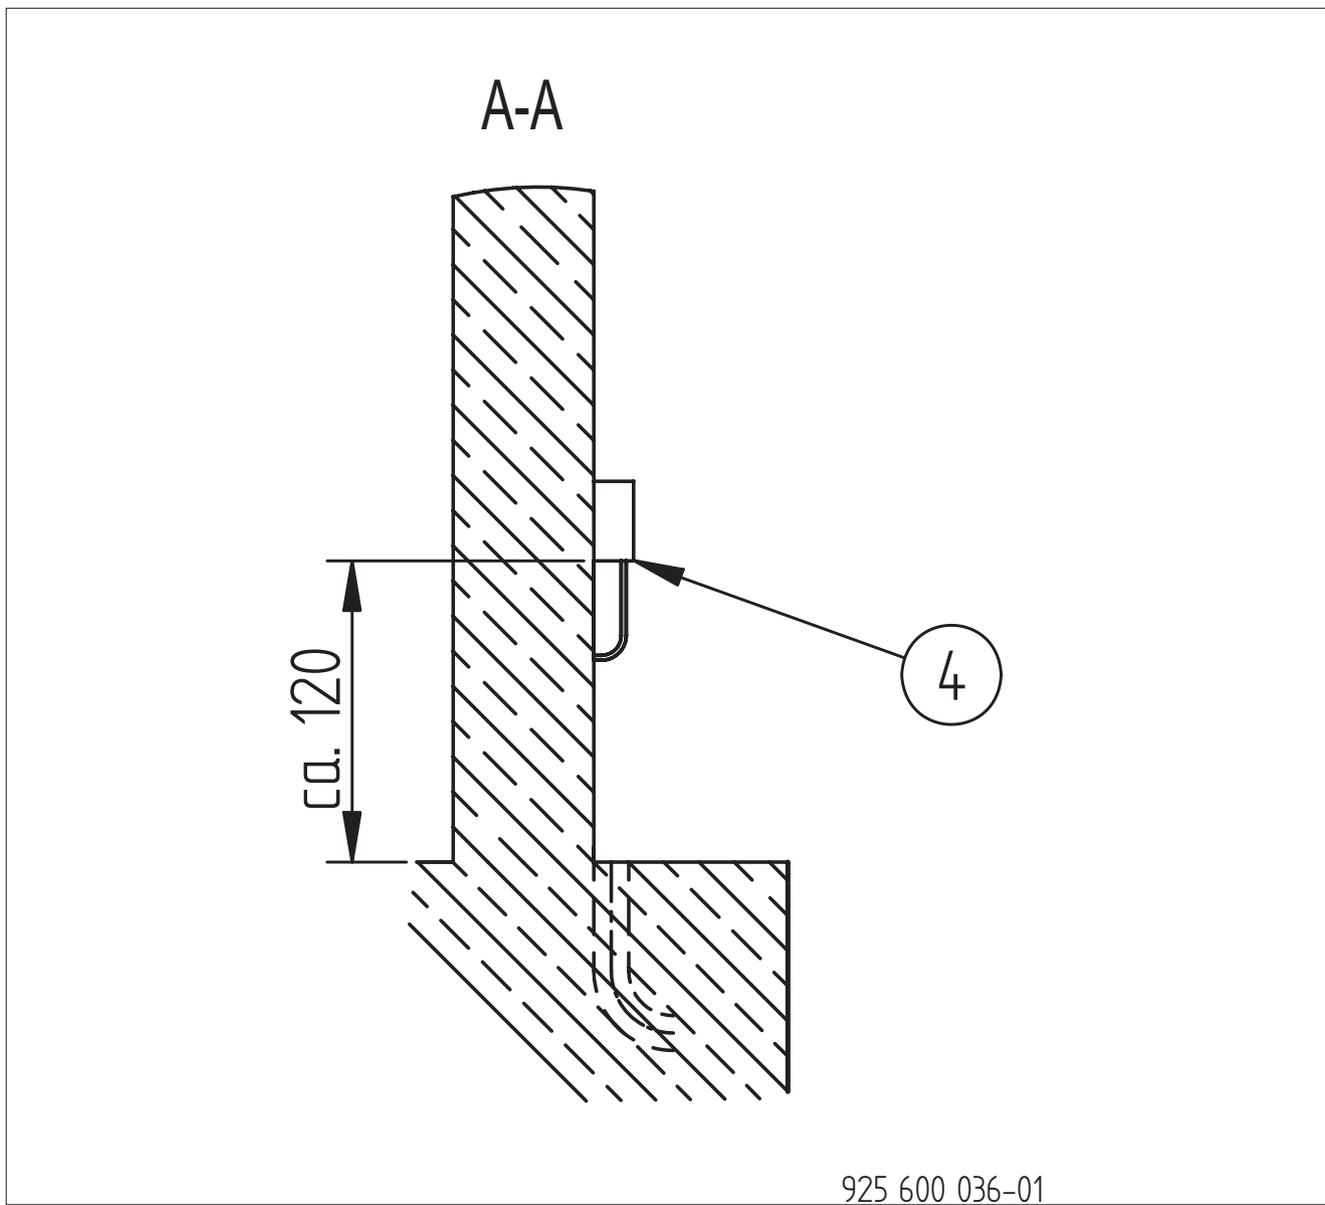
Installation plan BD 660 with PC, suspension tester and side slip tester - Sectional view A-A
